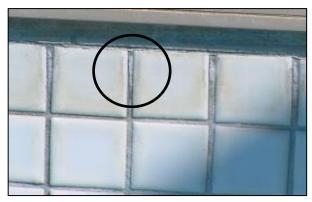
Showing telltale efflorescence on tile grout indicating water passing out from pool shell.
